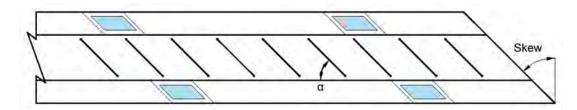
Plan View of 45 Degrees Skewed ITBC
